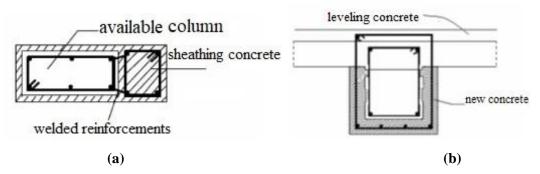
(a) Jacket strengthening plan of the column, (b) Strengthening section of the beam, Source: Gülmez, 2010.
